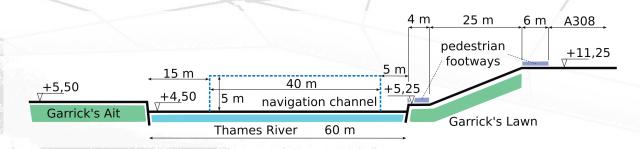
Elevation view of the area. All the height levels are expressed in m AOD.
